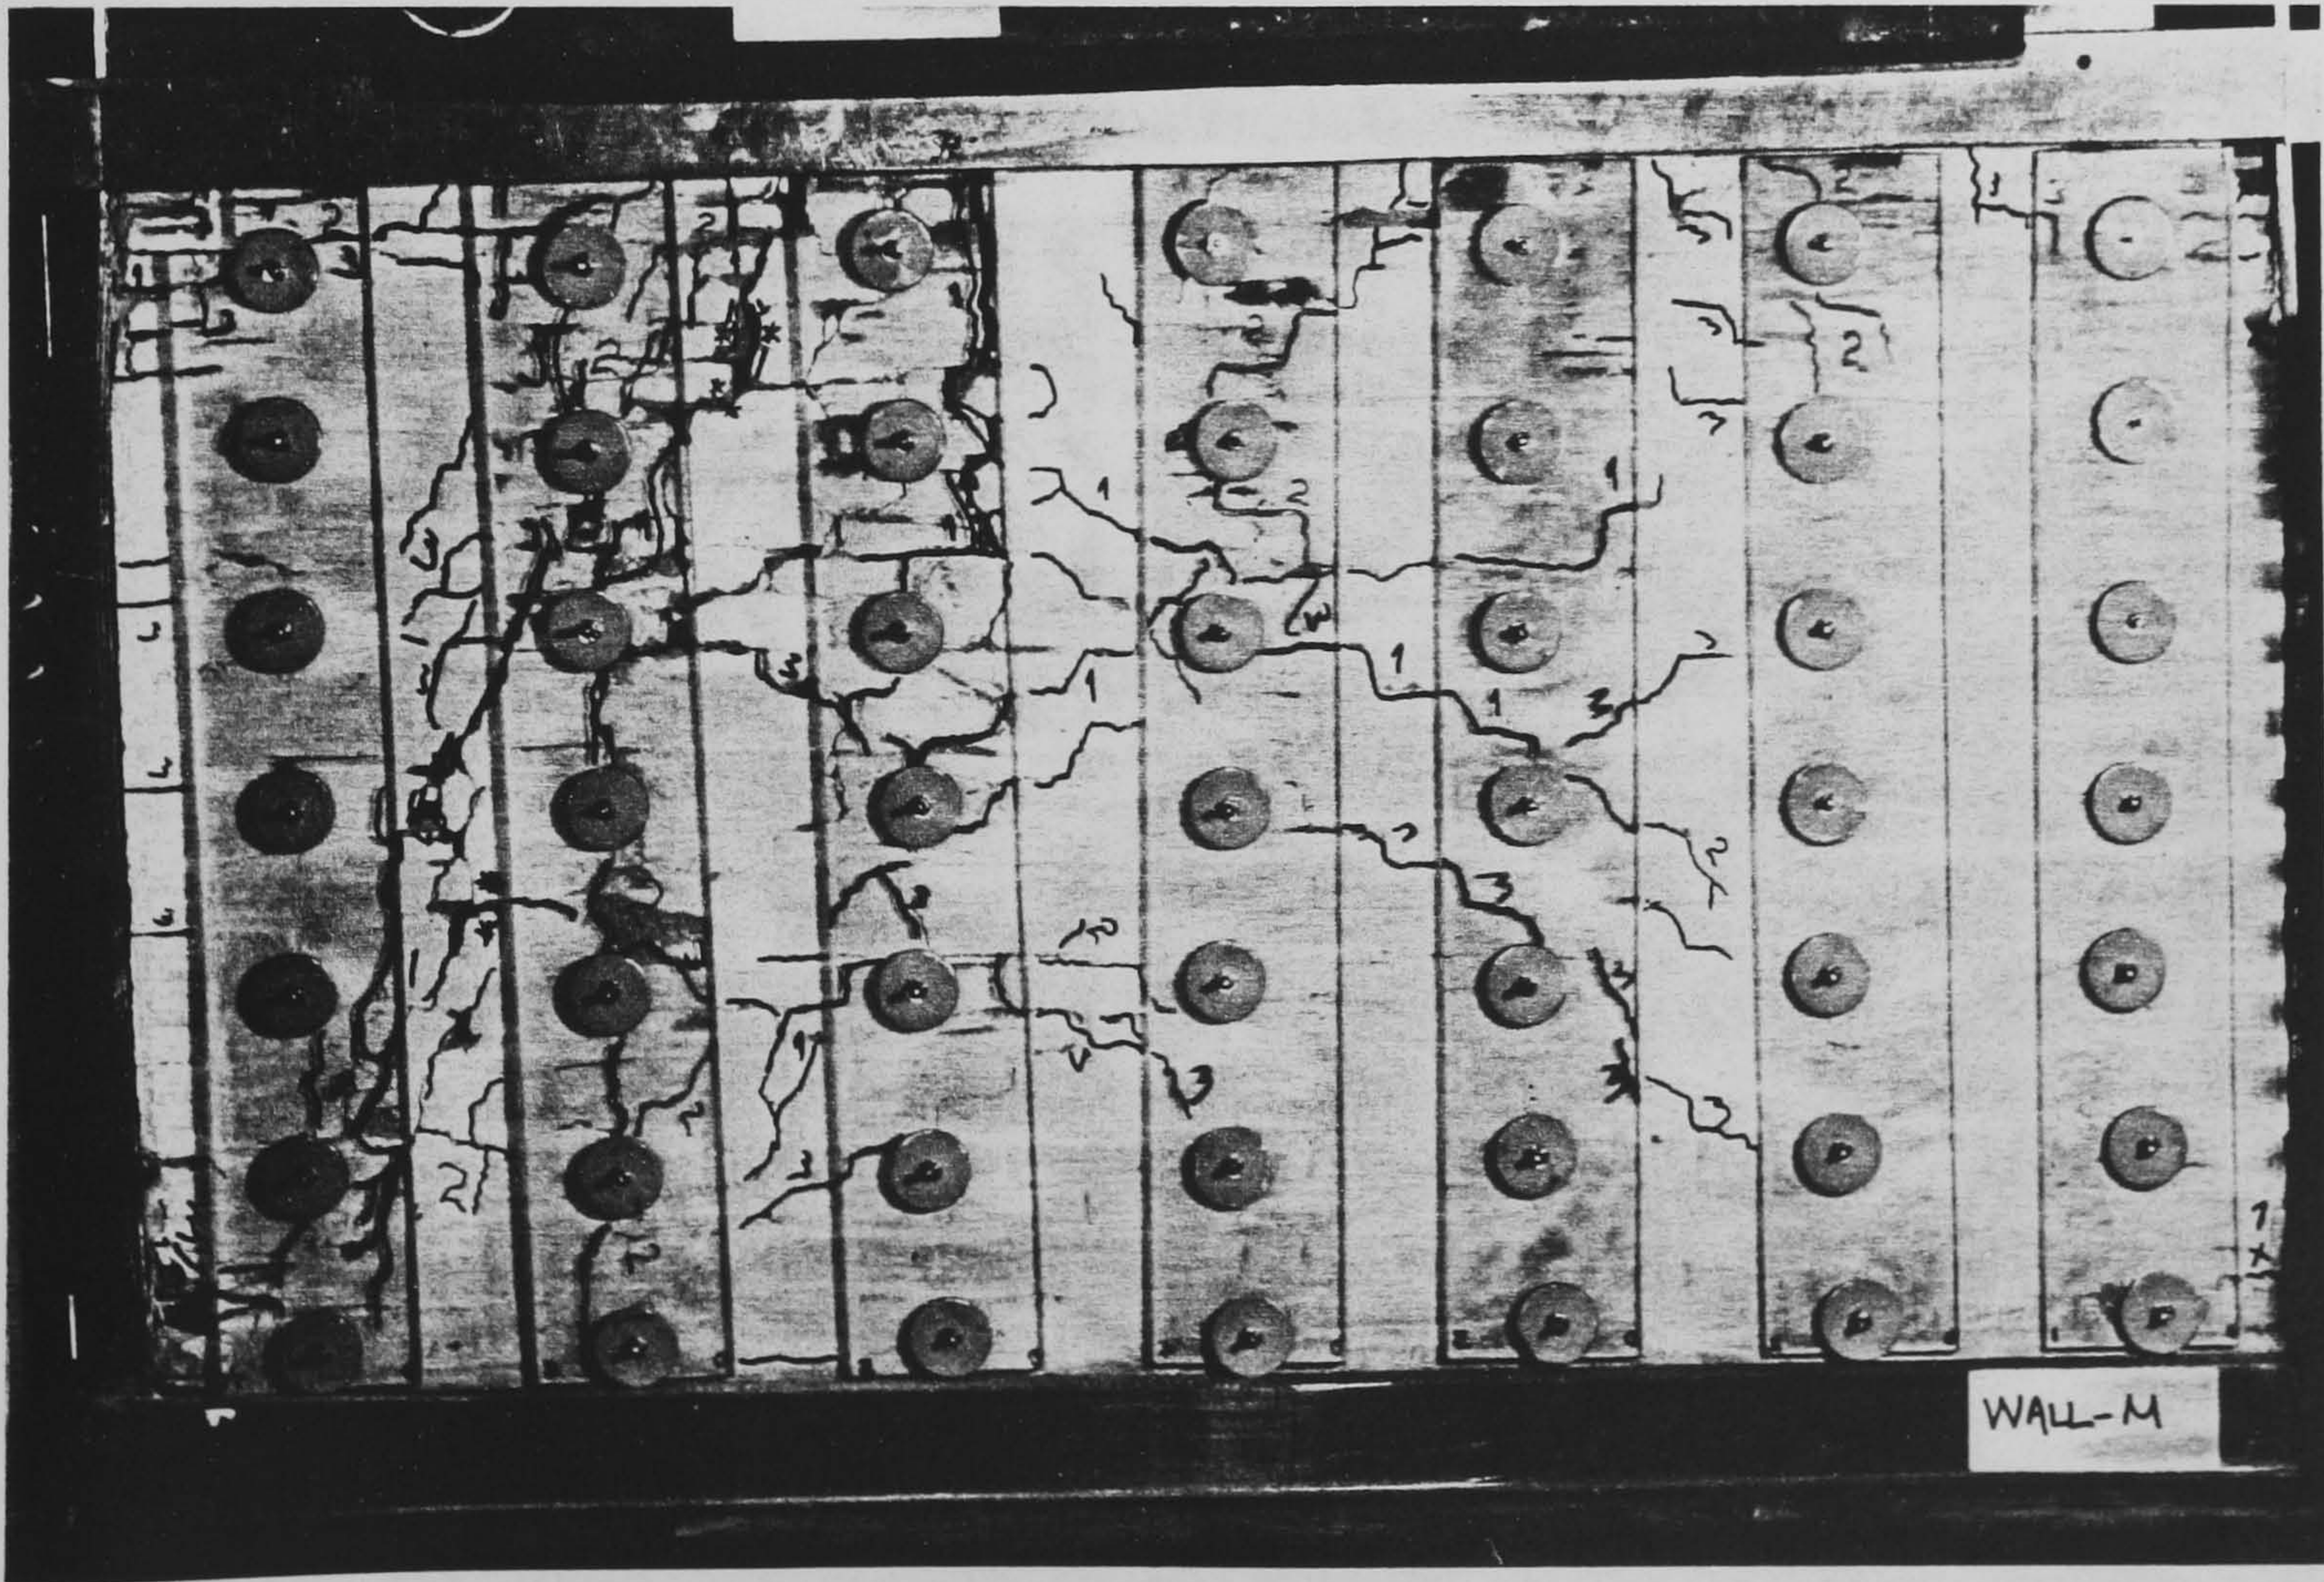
Cracking sequence with increasing ground acceleration-1 (wall-M)
